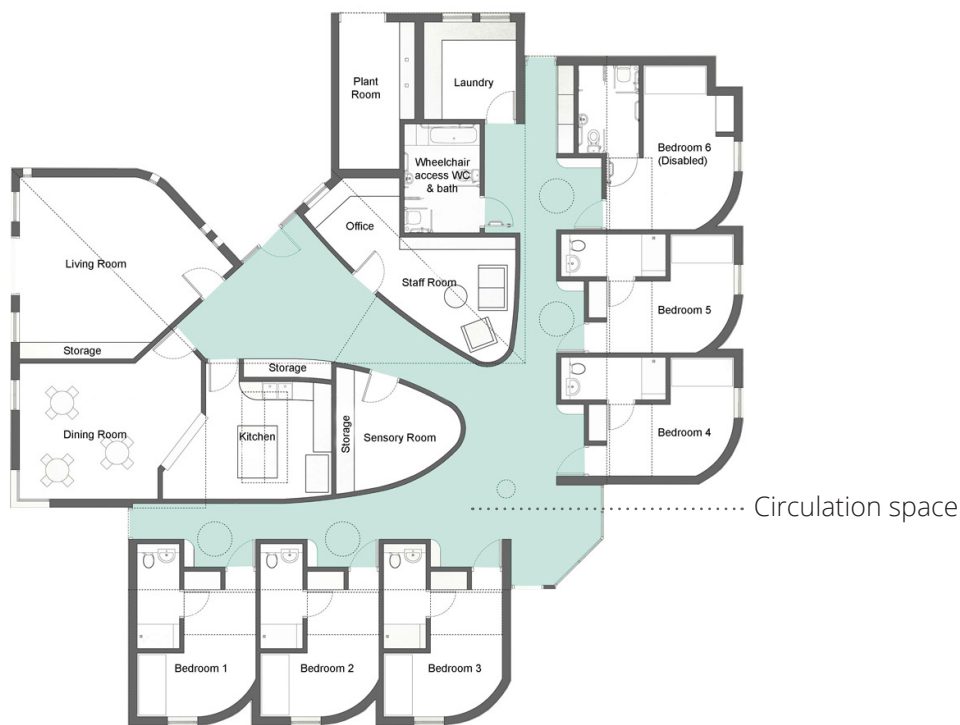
GA Architects, Respite Building, Langley Mill Nottingham, 2010, Ground floor
